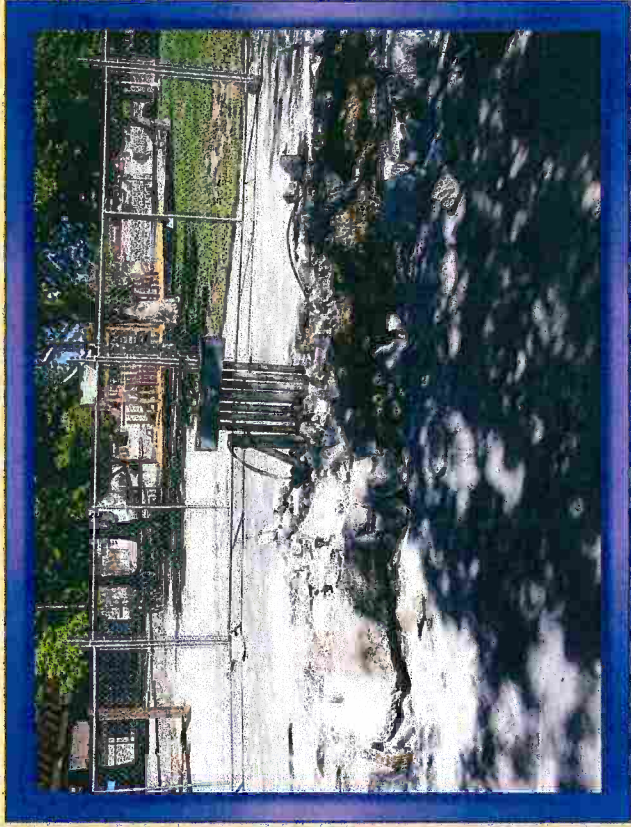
PHOTOS OF ANCHOR CONCRETE WORKING AT
